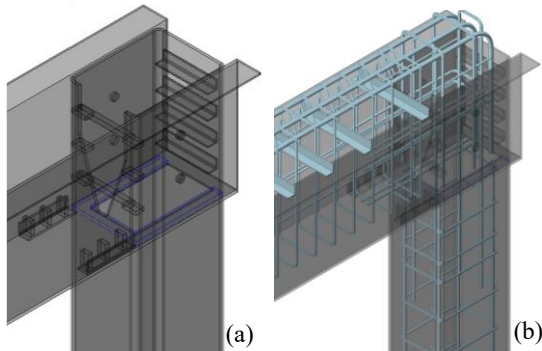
Details of the hybrid joint: with steel reinforcement (a) and with steel rebars (b)
